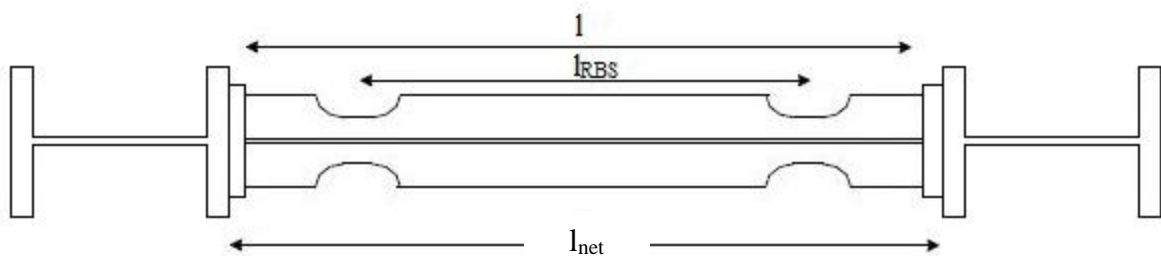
Typical section view and dimension of FUSEIS beam link system
